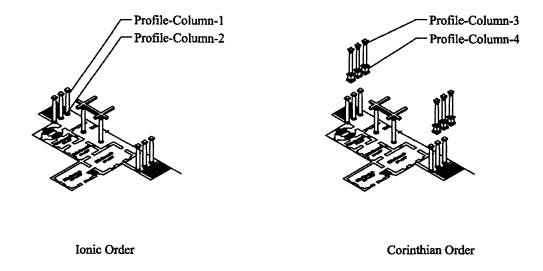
Interior and exterior columns, as well as the molded joist at the main hall
